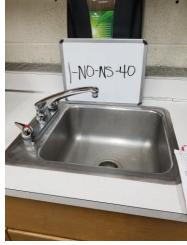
Nurses sink, located on the 1st floor in the nurse's odffice.
